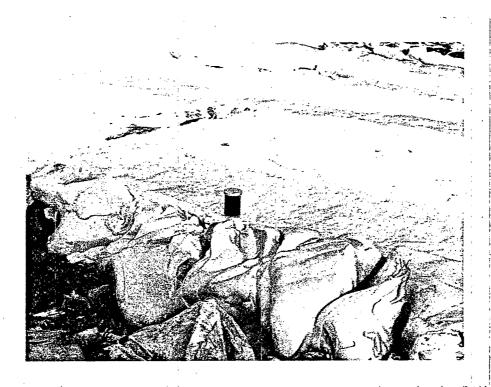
Close-up view of TerraFoam™ immediately after application of a 6-in. (15-cm) thick layer.
